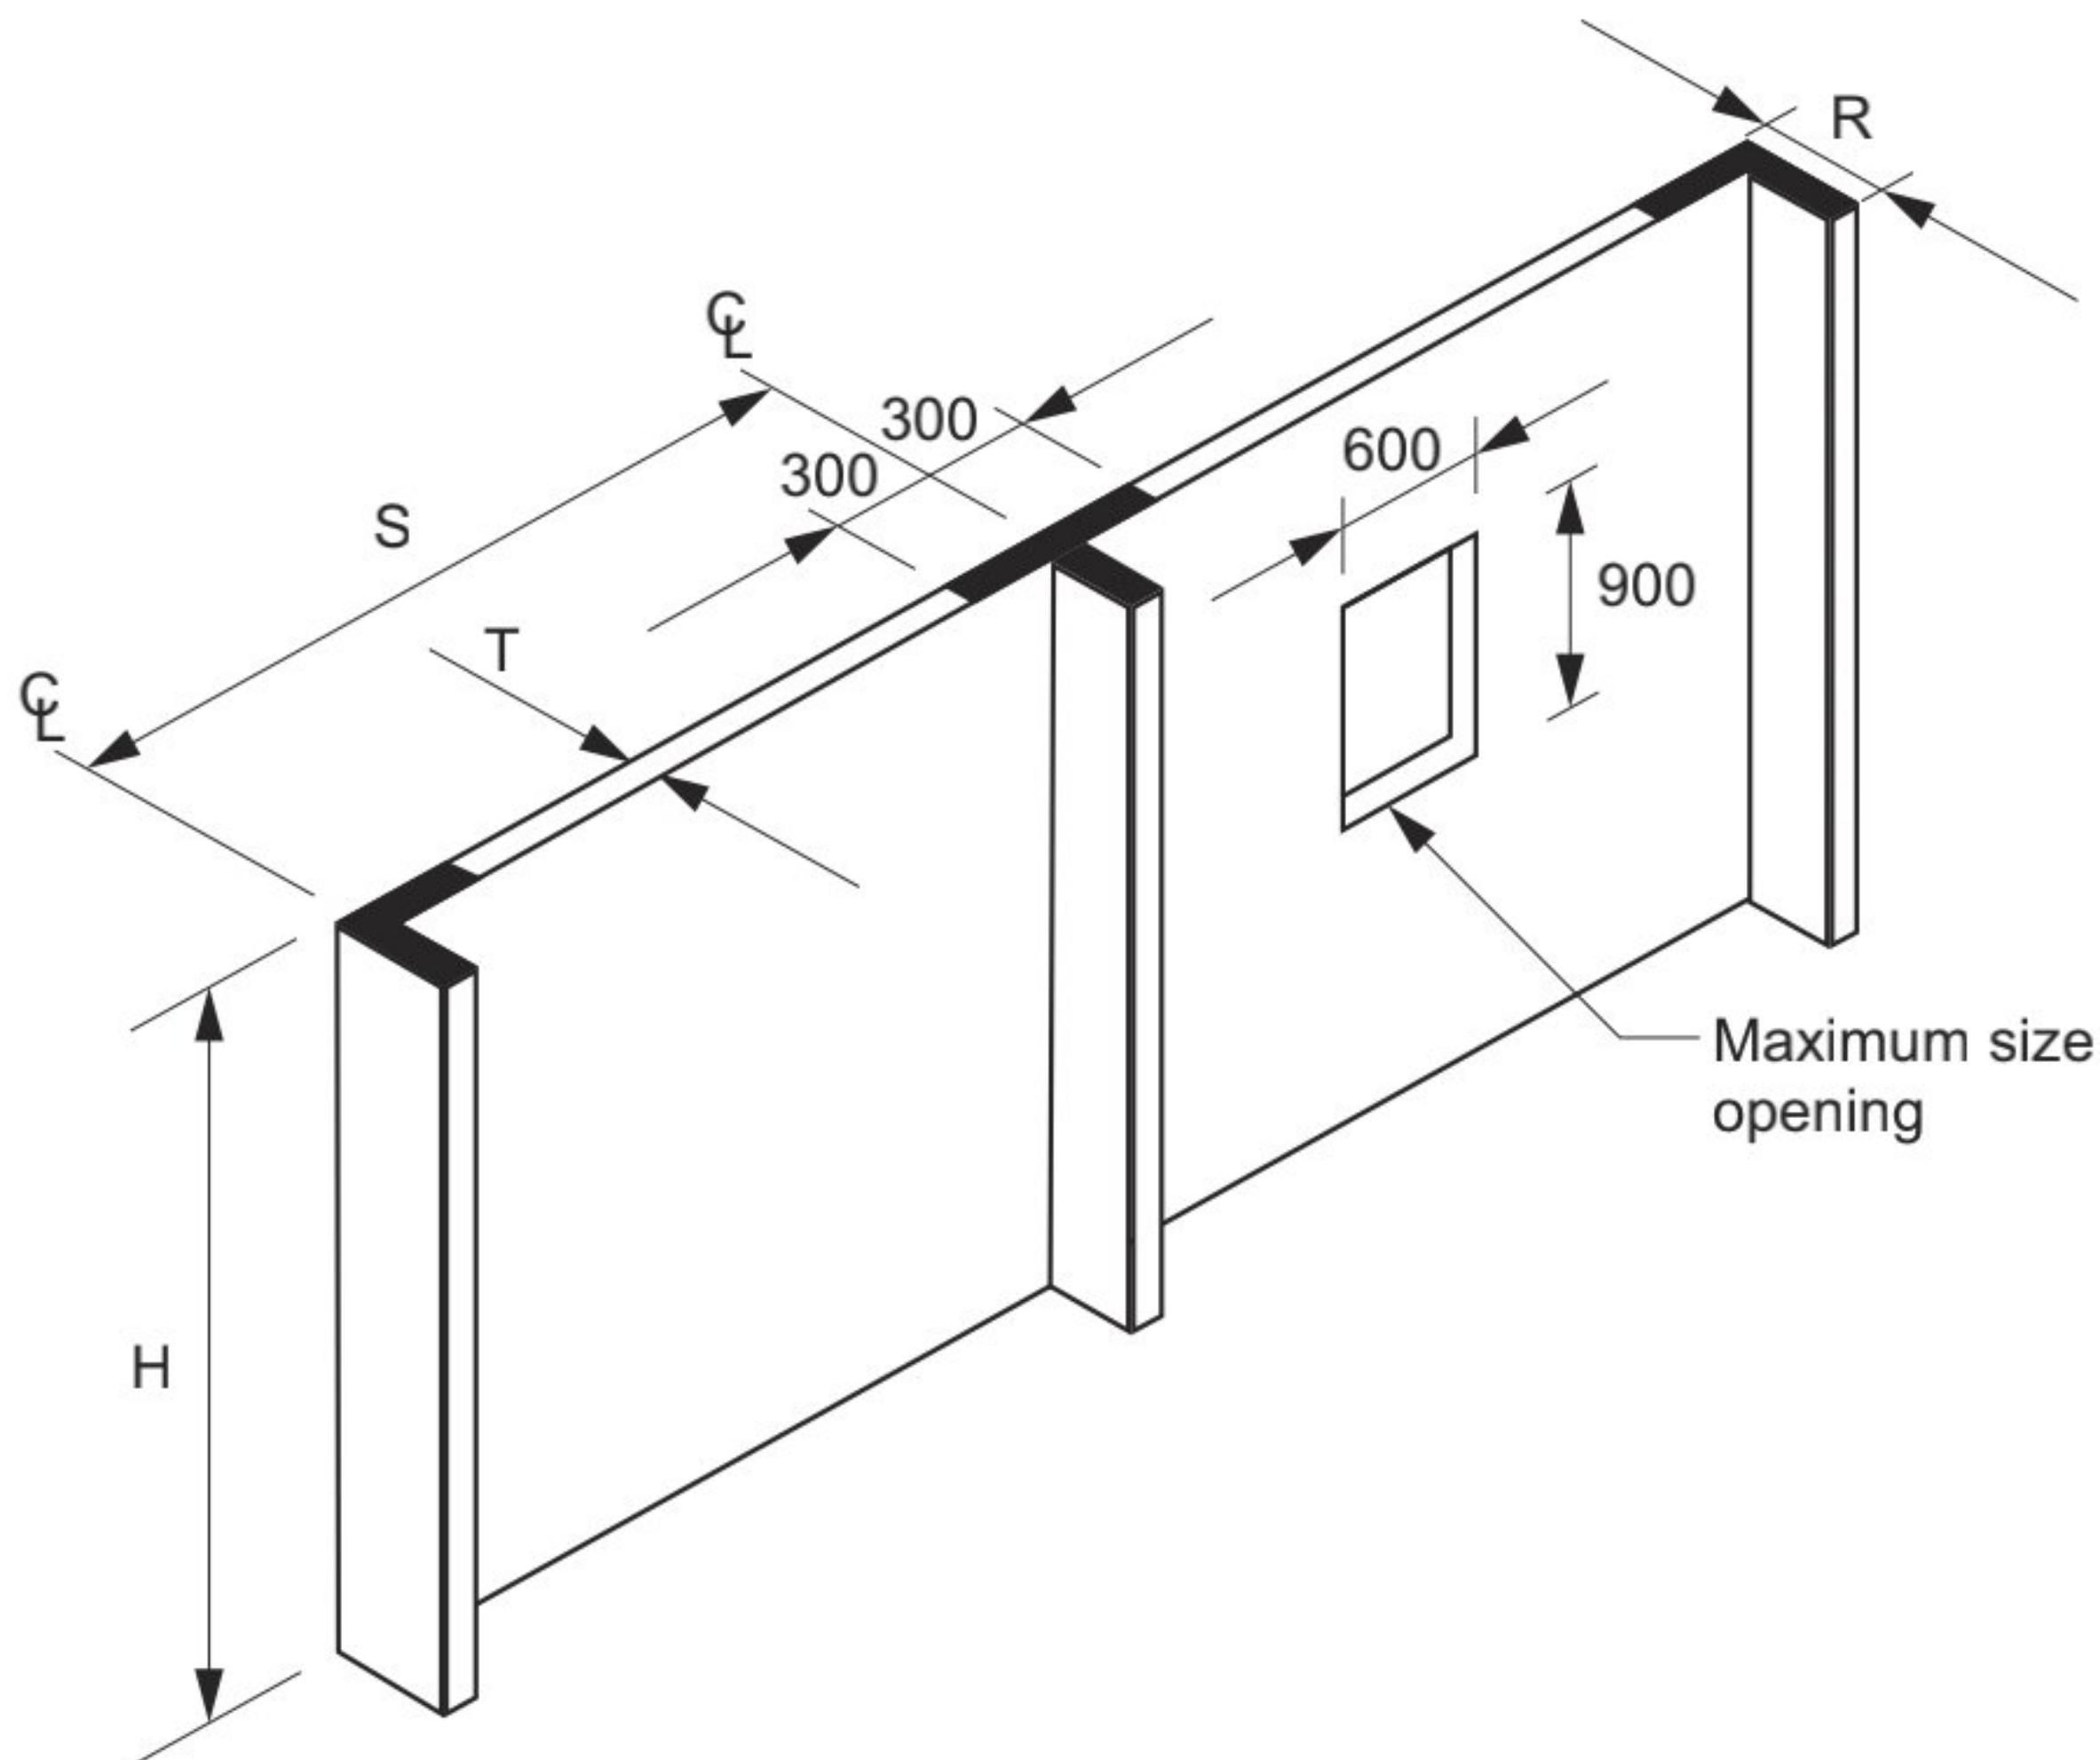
Engaged piers in external single leaf masonry walls to AS 3700
